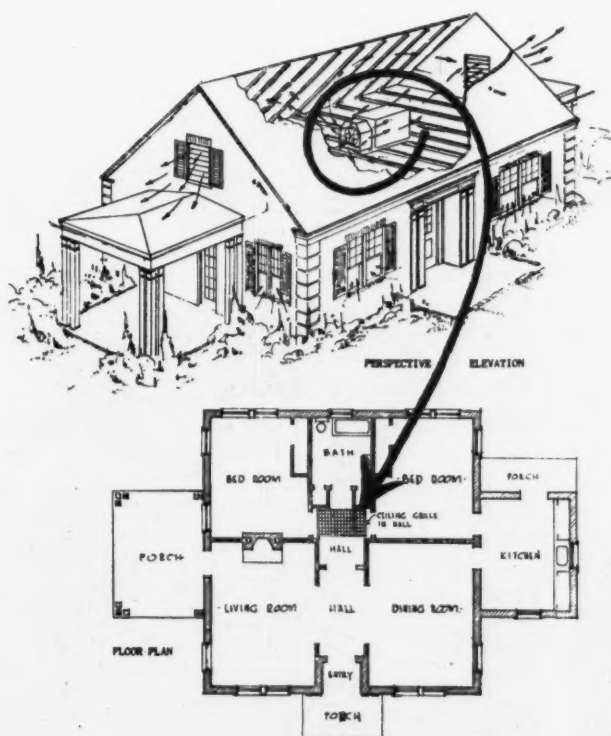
Typical one-story house installation with central grille and exhaust through gable louvers. The attic is cooled along with the house in this type of installation. (American Blower Corp.)
